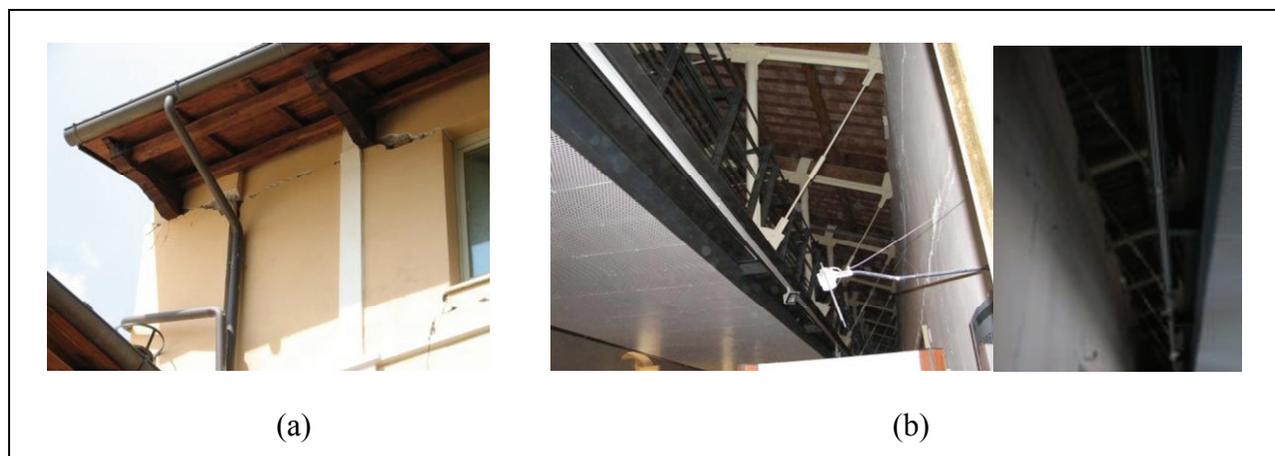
Collapse of the roof due to the presence of a (b) metal walkway anchored to the wooden roof trusses in the ex-convent of Santa Maria dei Raccomandati
